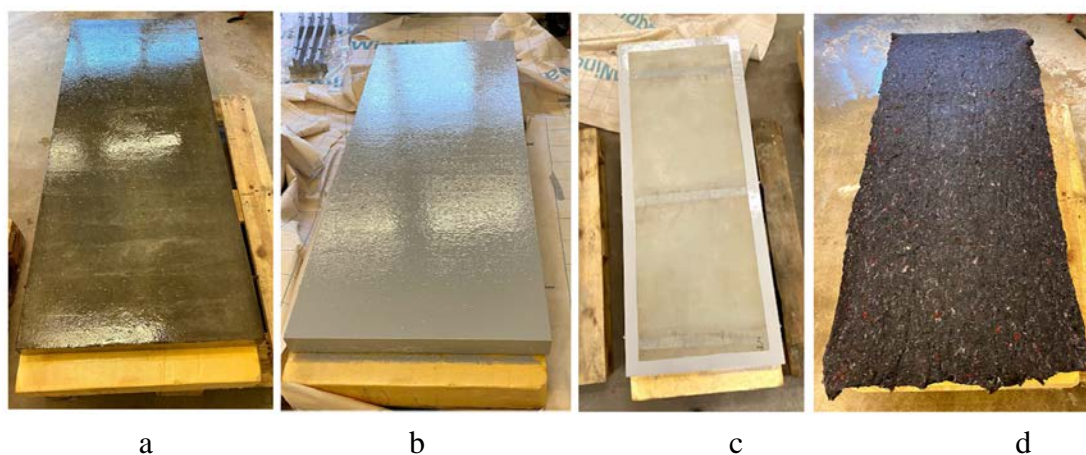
Interior side of a wall segment treated with primer (a) and epoxy paint (b). Drying area of the exterior surface (c) and the wet shoddy (d).
